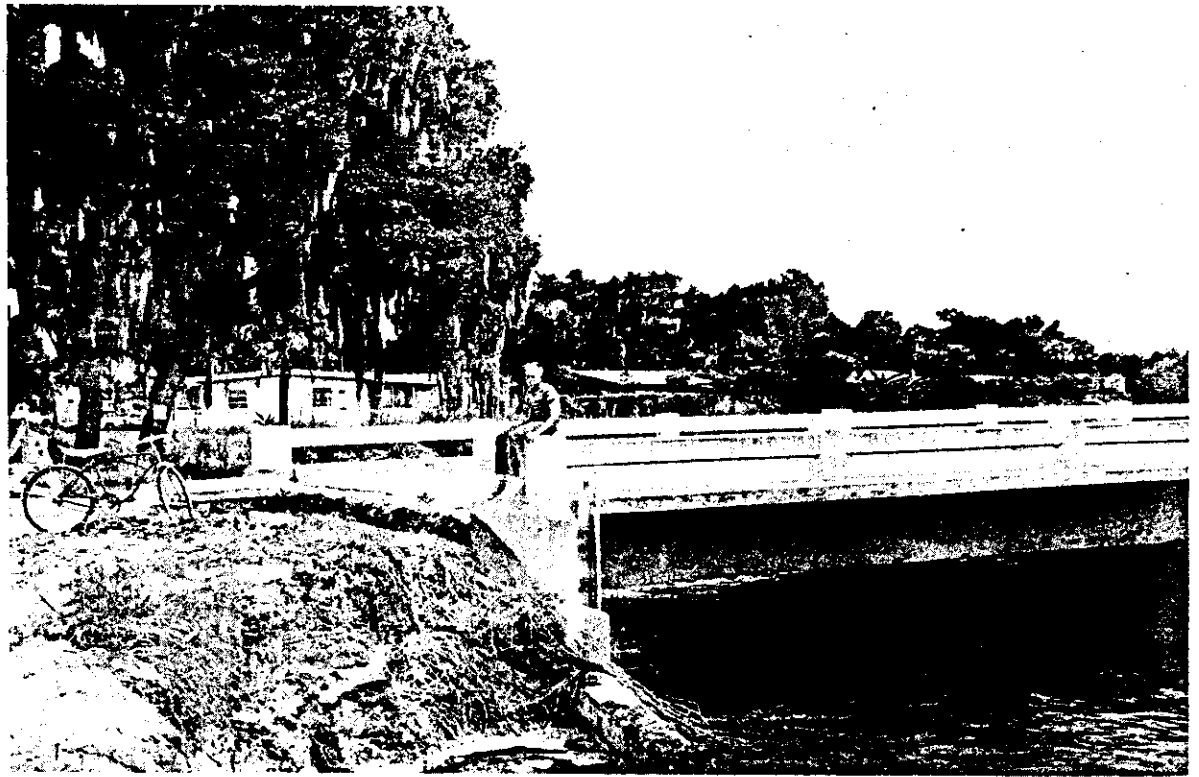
BAHIA VISTA STREET BRIDGE WASHOUT ON PHILLIPPI CREEK. FLOOD PEAKED 2 TO 3 FEET ABOVE DECK OF BRIDGE. (SEPT. 1962)
